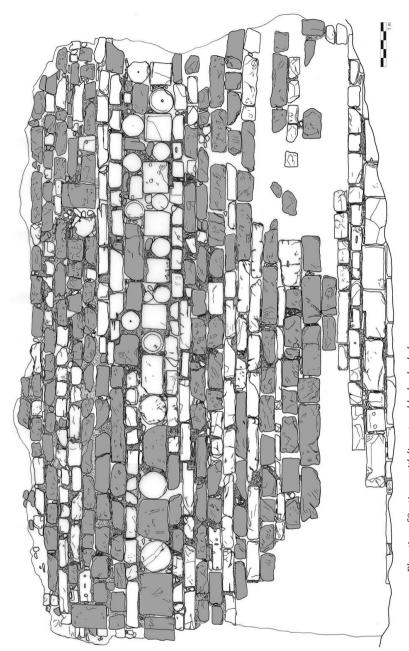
Elevation of Section R with limestone blocks shaded Drawing J. frey
